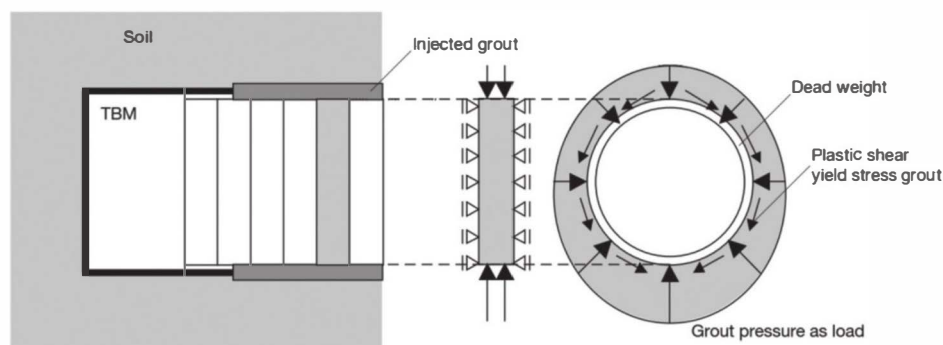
Forces and definitions for load case of tail void back-grouting (Groeneweg 2007).
